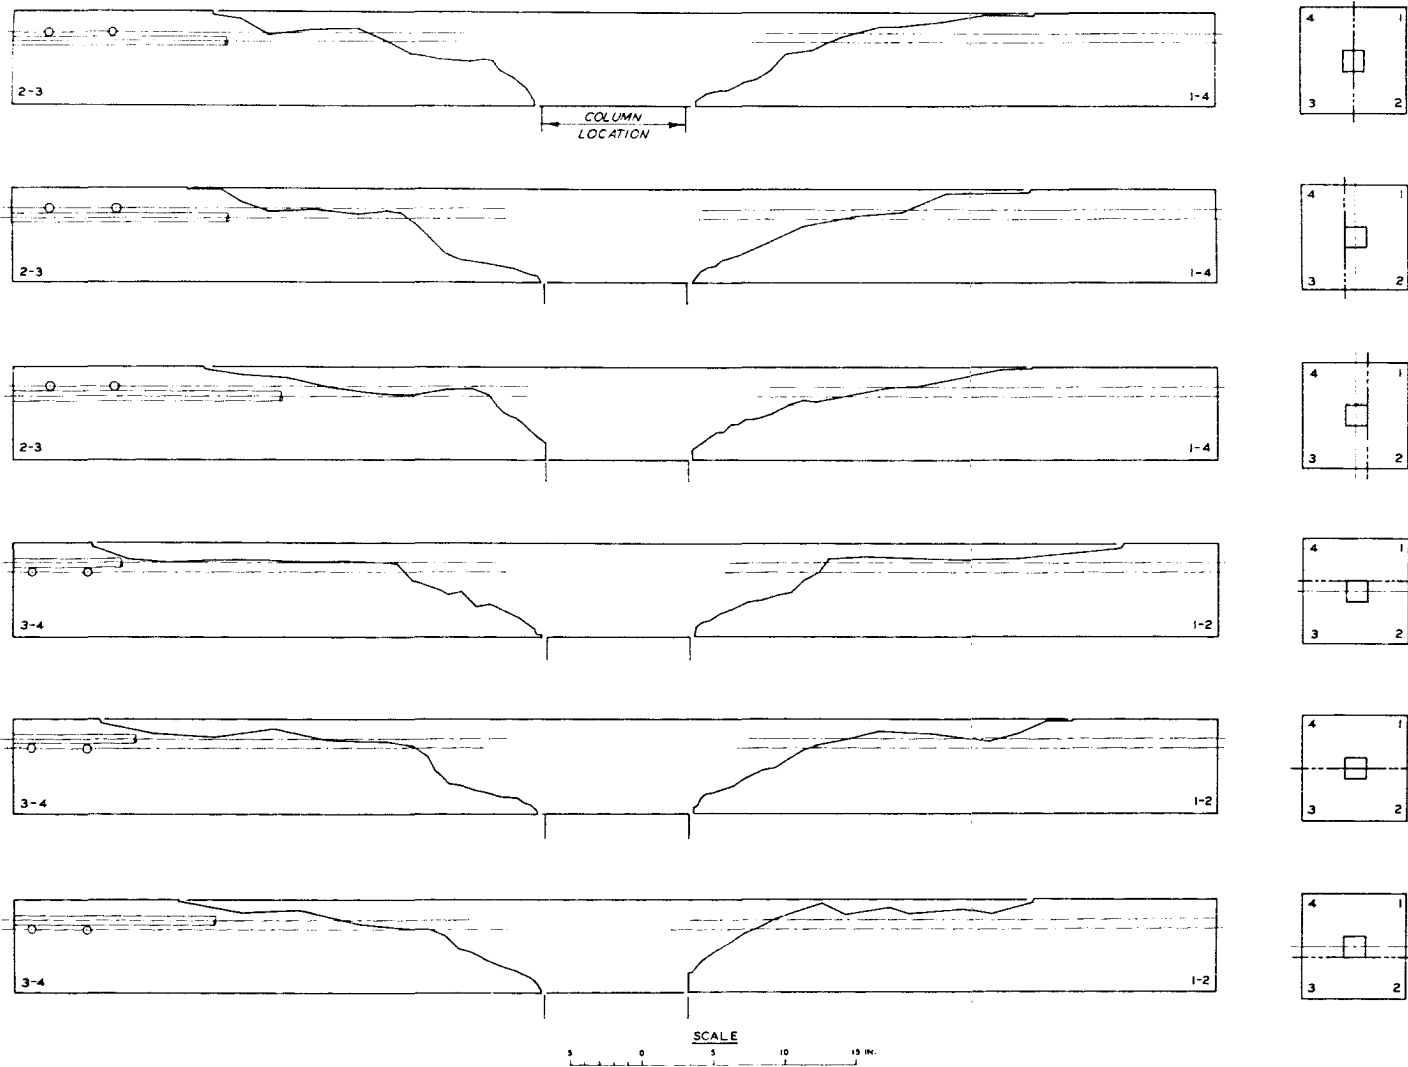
Profiles of slab failure surface, Specimen D2150-3.
